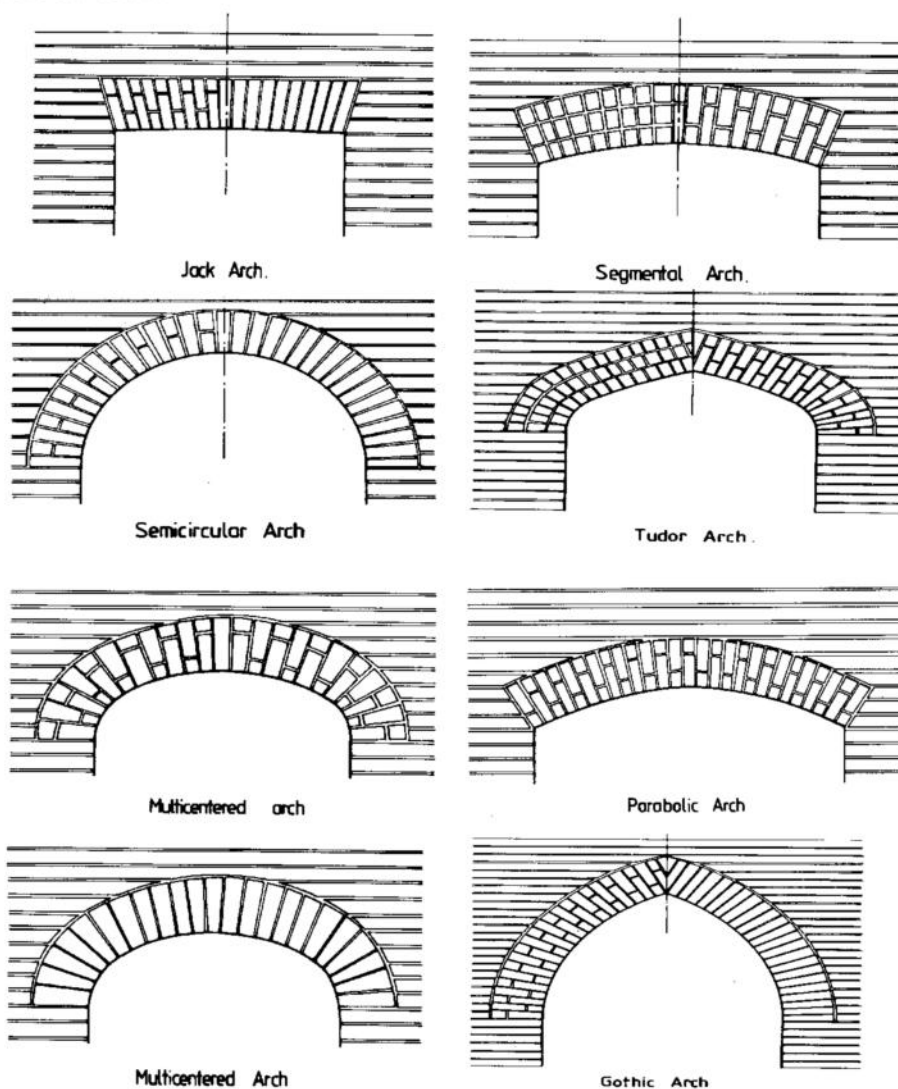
Common Shapes of Masonry Arch used in Bridge Construction
